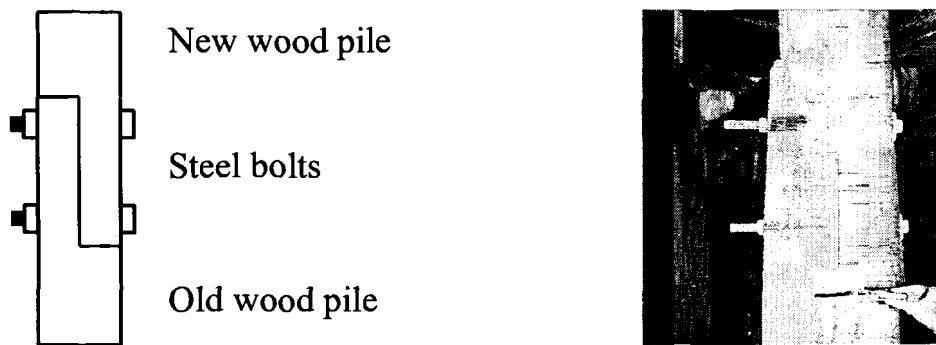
Splicing of Wood Piles with Steel Bolts
